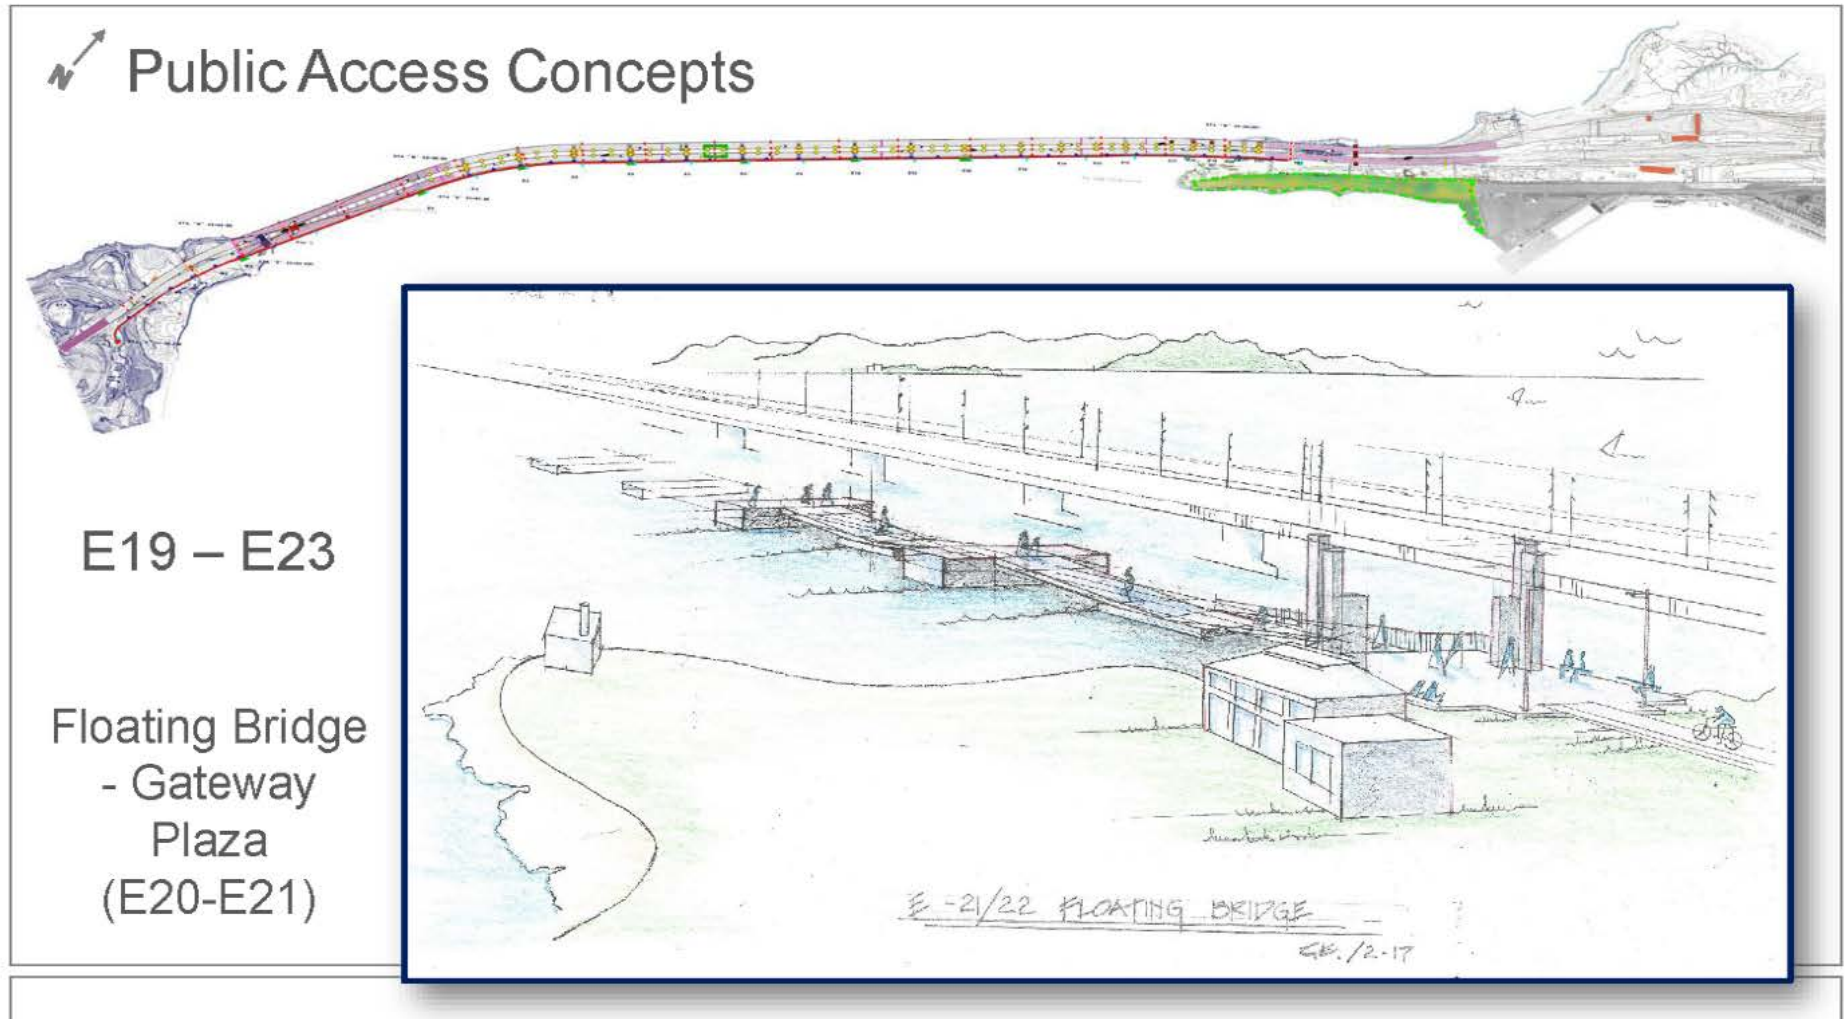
Conceptual Plan of Floating Pier-Piers E21 to E23-OTD Alternative 2
